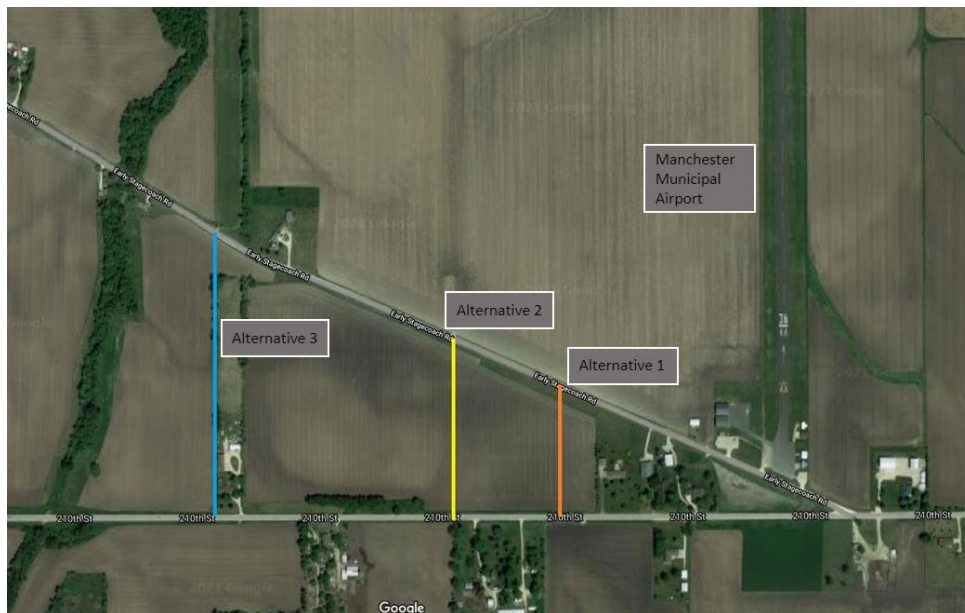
A: Design Alternatives and Overview of Project Site Location facing north.
